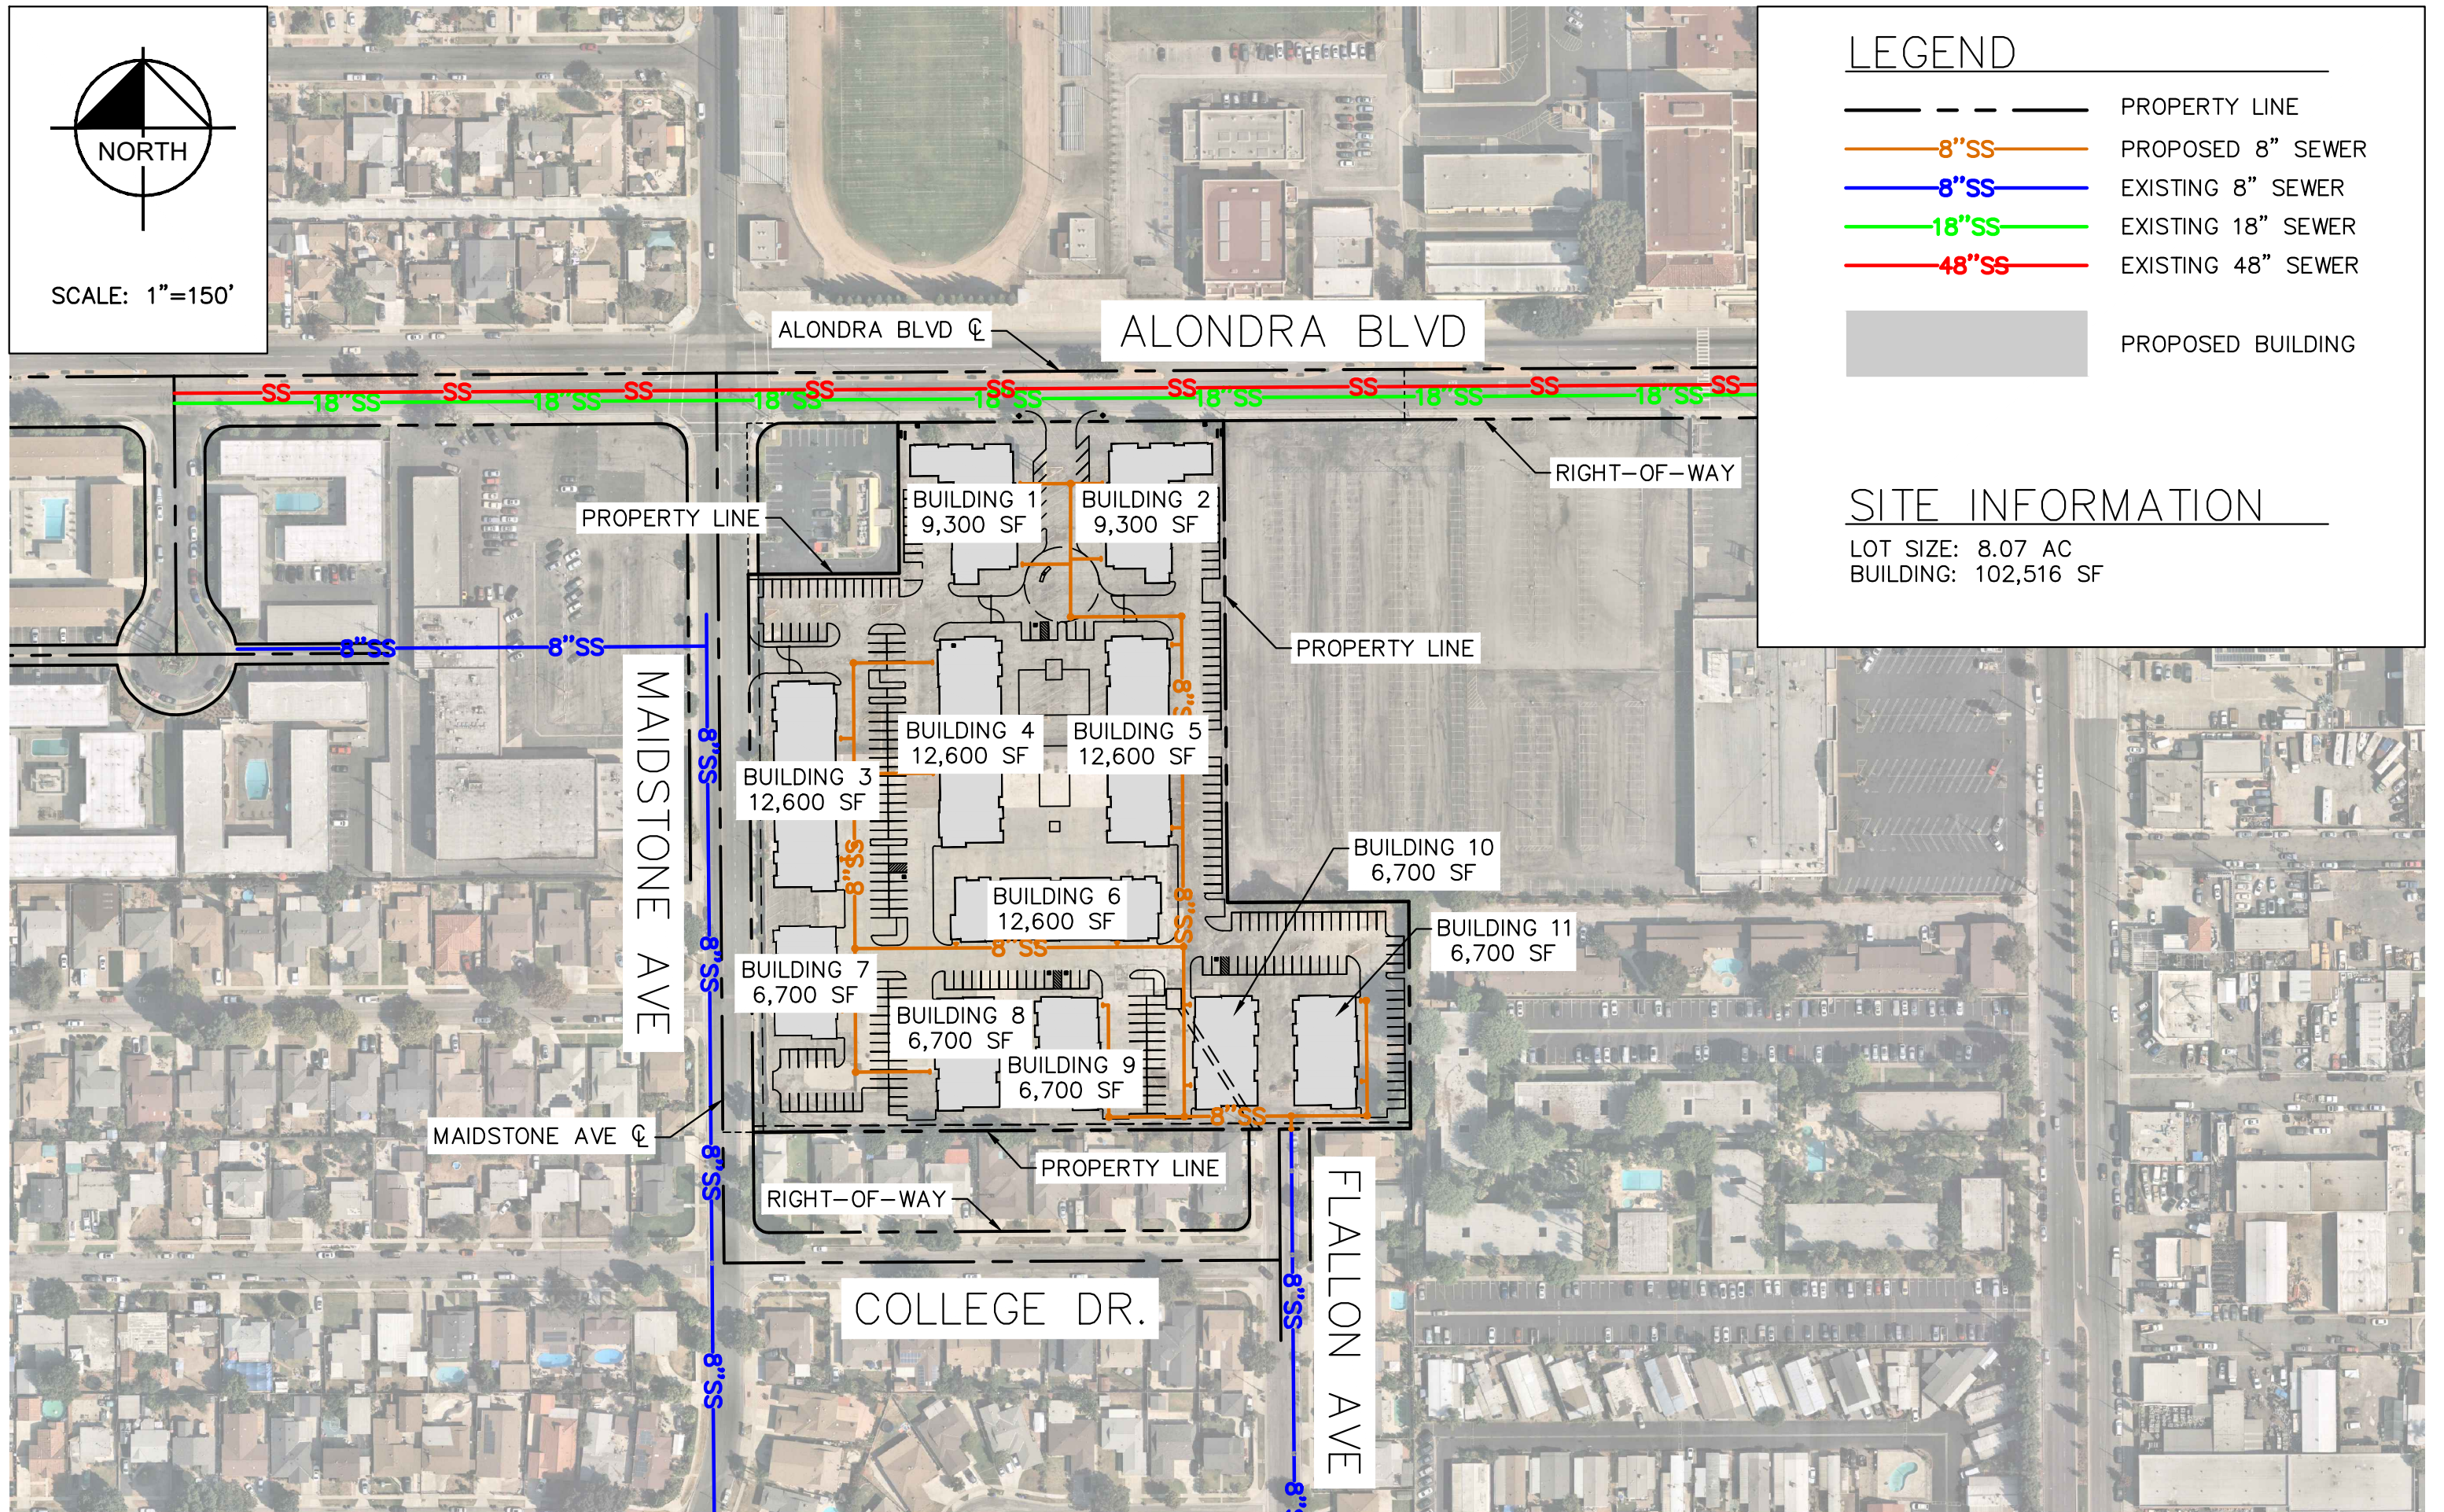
EXHIBIT A: PROPOSED ONSITE SEWER LAYOUT
